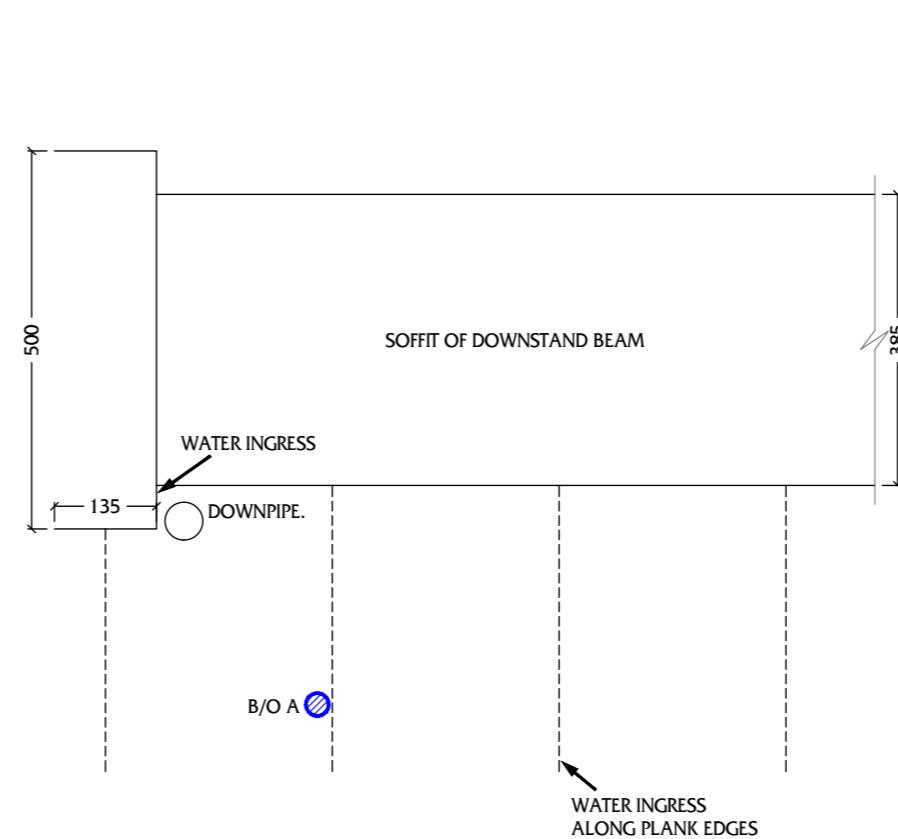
PART SECTION LOOKING SOUTH THROUGH ROOF SLAB SHOWING DETAILS OF PRECAST CONCRETE PLANK - SURVEY AREA RS1 SCALE 1:5
